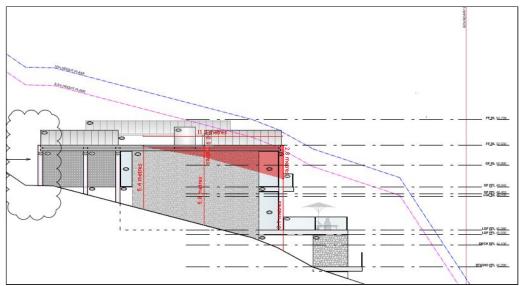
South Elevation (red highlighting numerical building envelope non-compliance)
